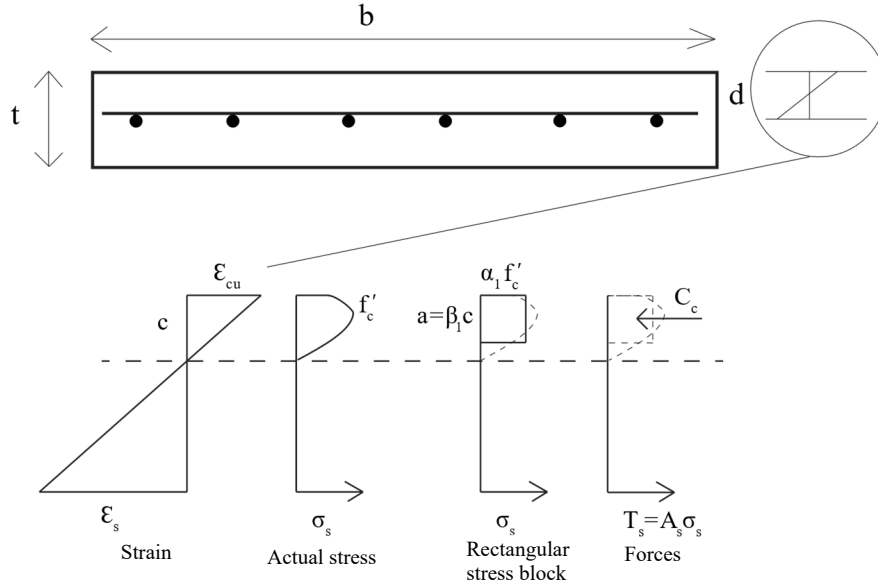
Strain profile, stress profile, and resultant forces for SR concrete walls.
